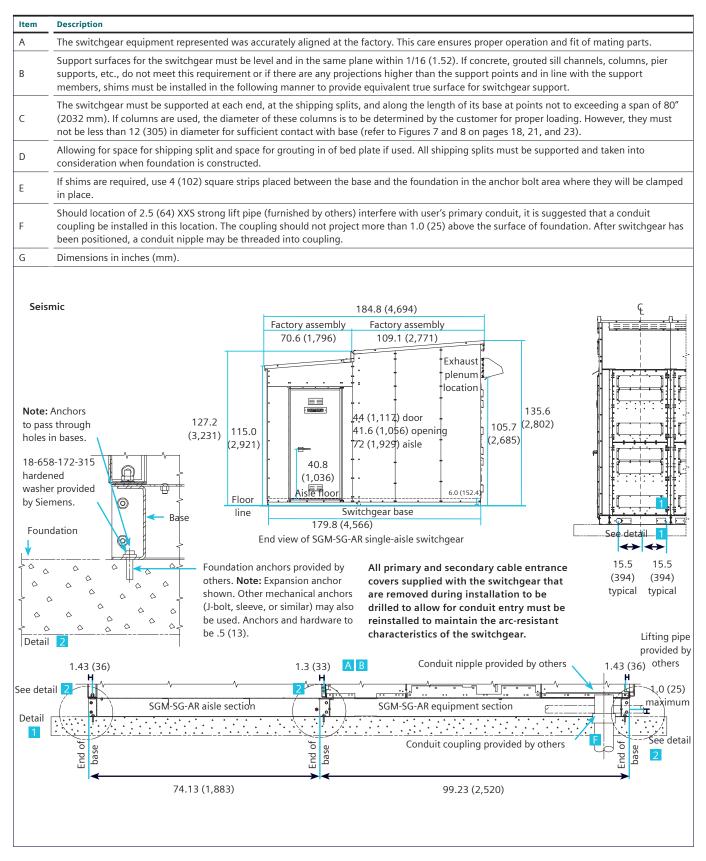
Anchoring outdoor type SGM-SG-AR Shelter-Clad single-aisle switchgear rated up to 17.5kV
